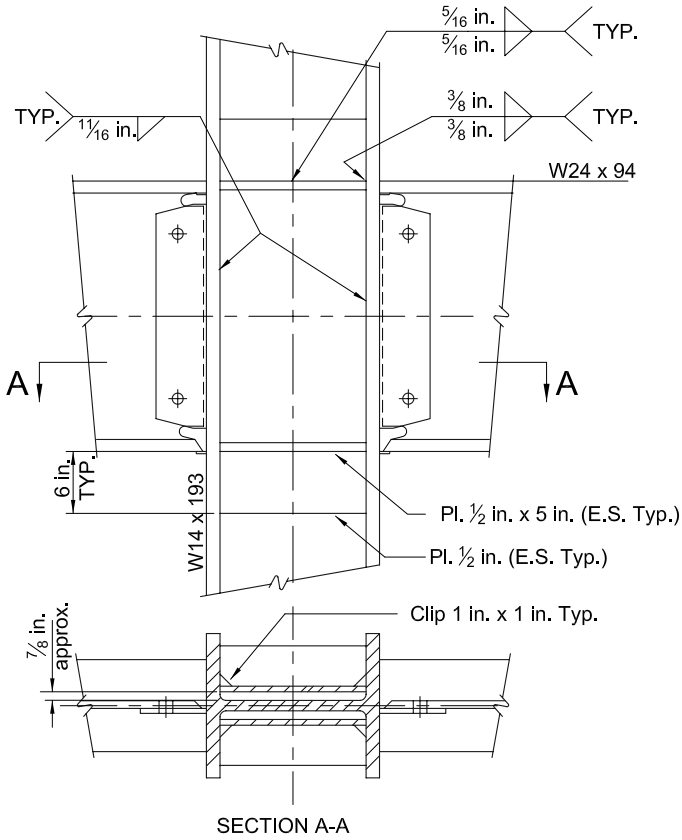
Example of fillet welded doubler plate and stiffener details.
